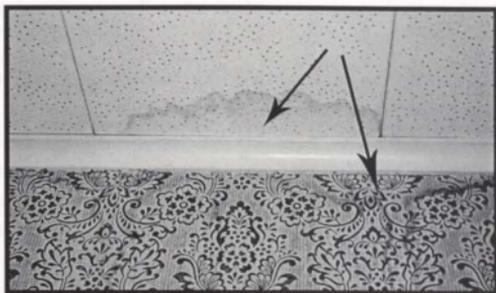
Discoloration on the wallpaper of the first floor Women's Restroom has occurred due to water infiltration through its western wall.
